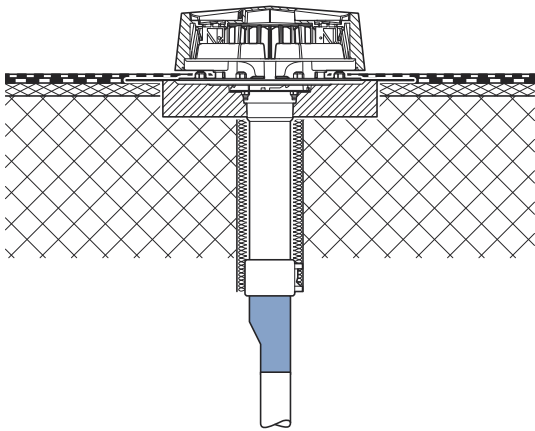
Connecting the Geberit Pluvia outlet with a reducer
